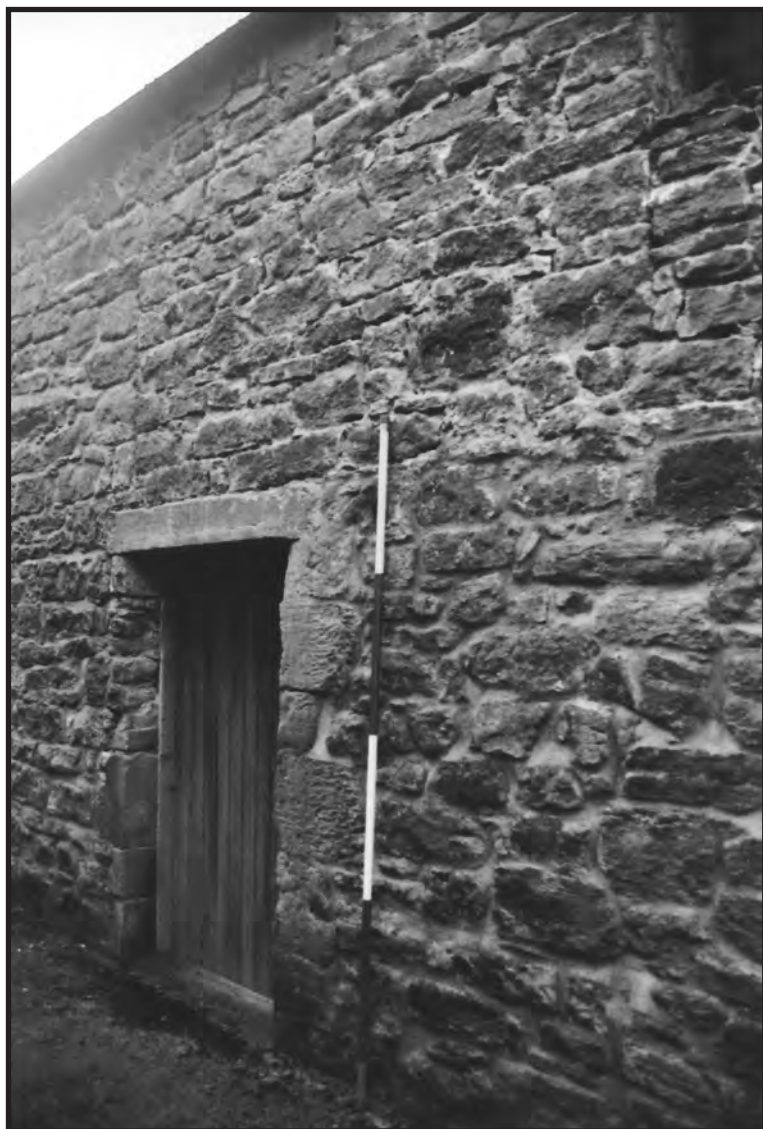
General view of the south-east facing elevation of Building A from the south showing (centre) window F40, a later insertion within the stone blocking of doorway F41
